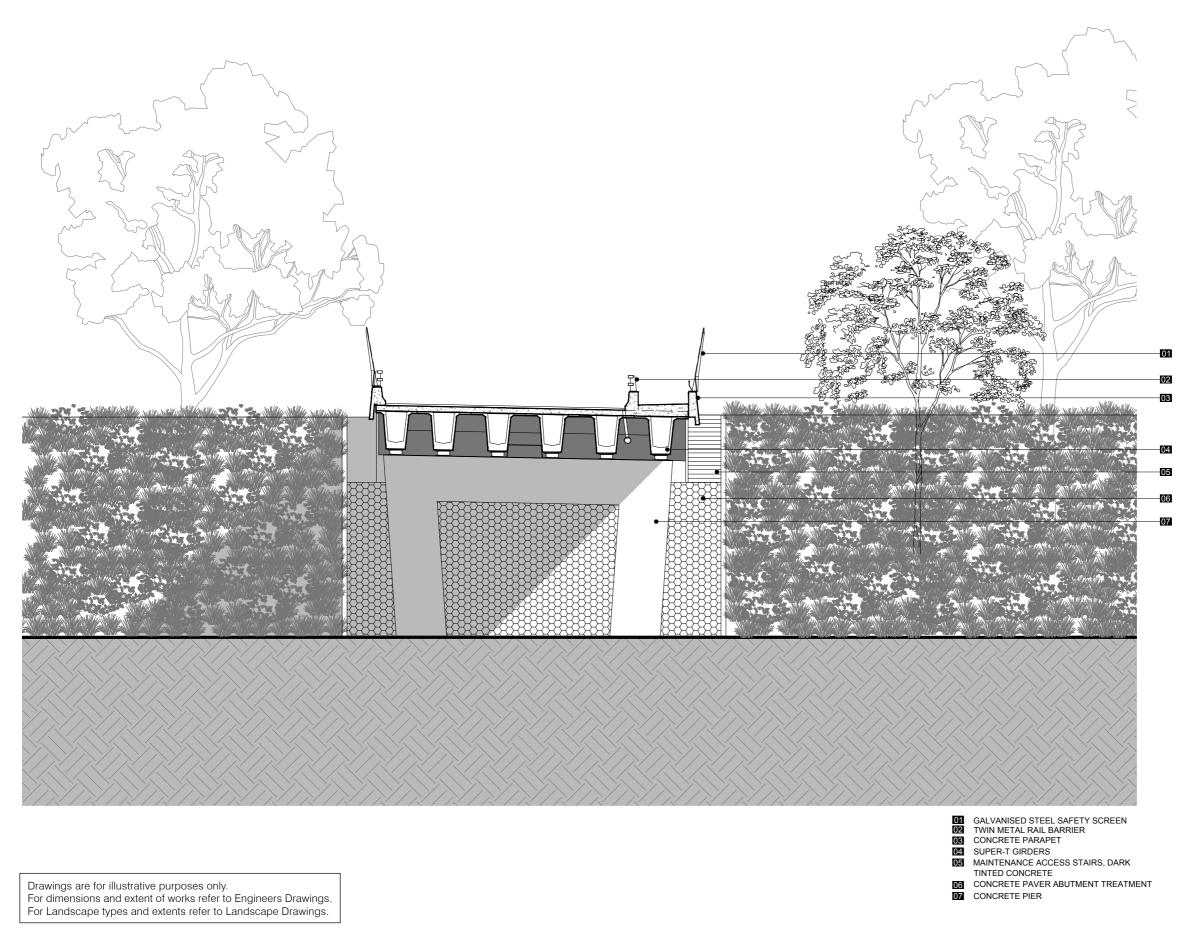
Bridge over Highway No.10 at East West Road: Elevation
